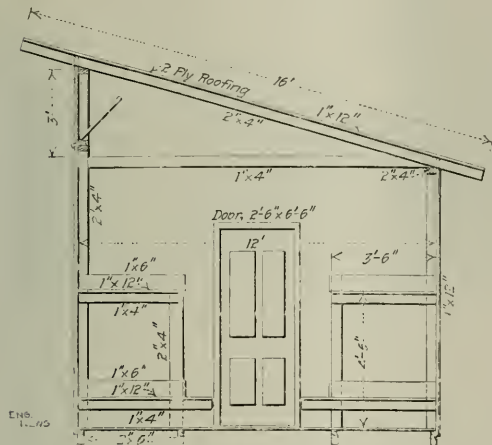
CROSS-SECTION OF BUNK HOUSE, TORRANCE CONSTRUCTION CAMP
